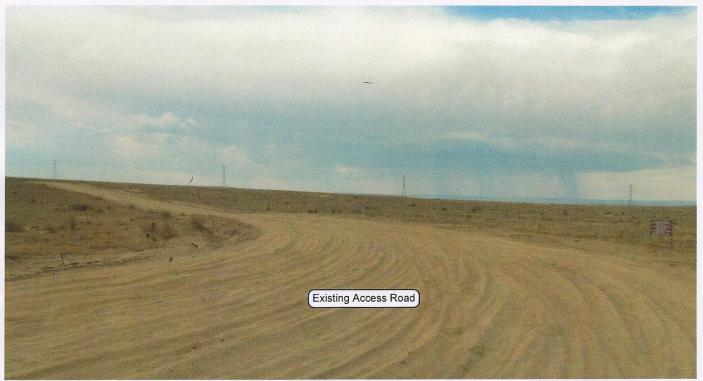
PHOTO VIEW: FROM EXISTING ACCESS ROAD
